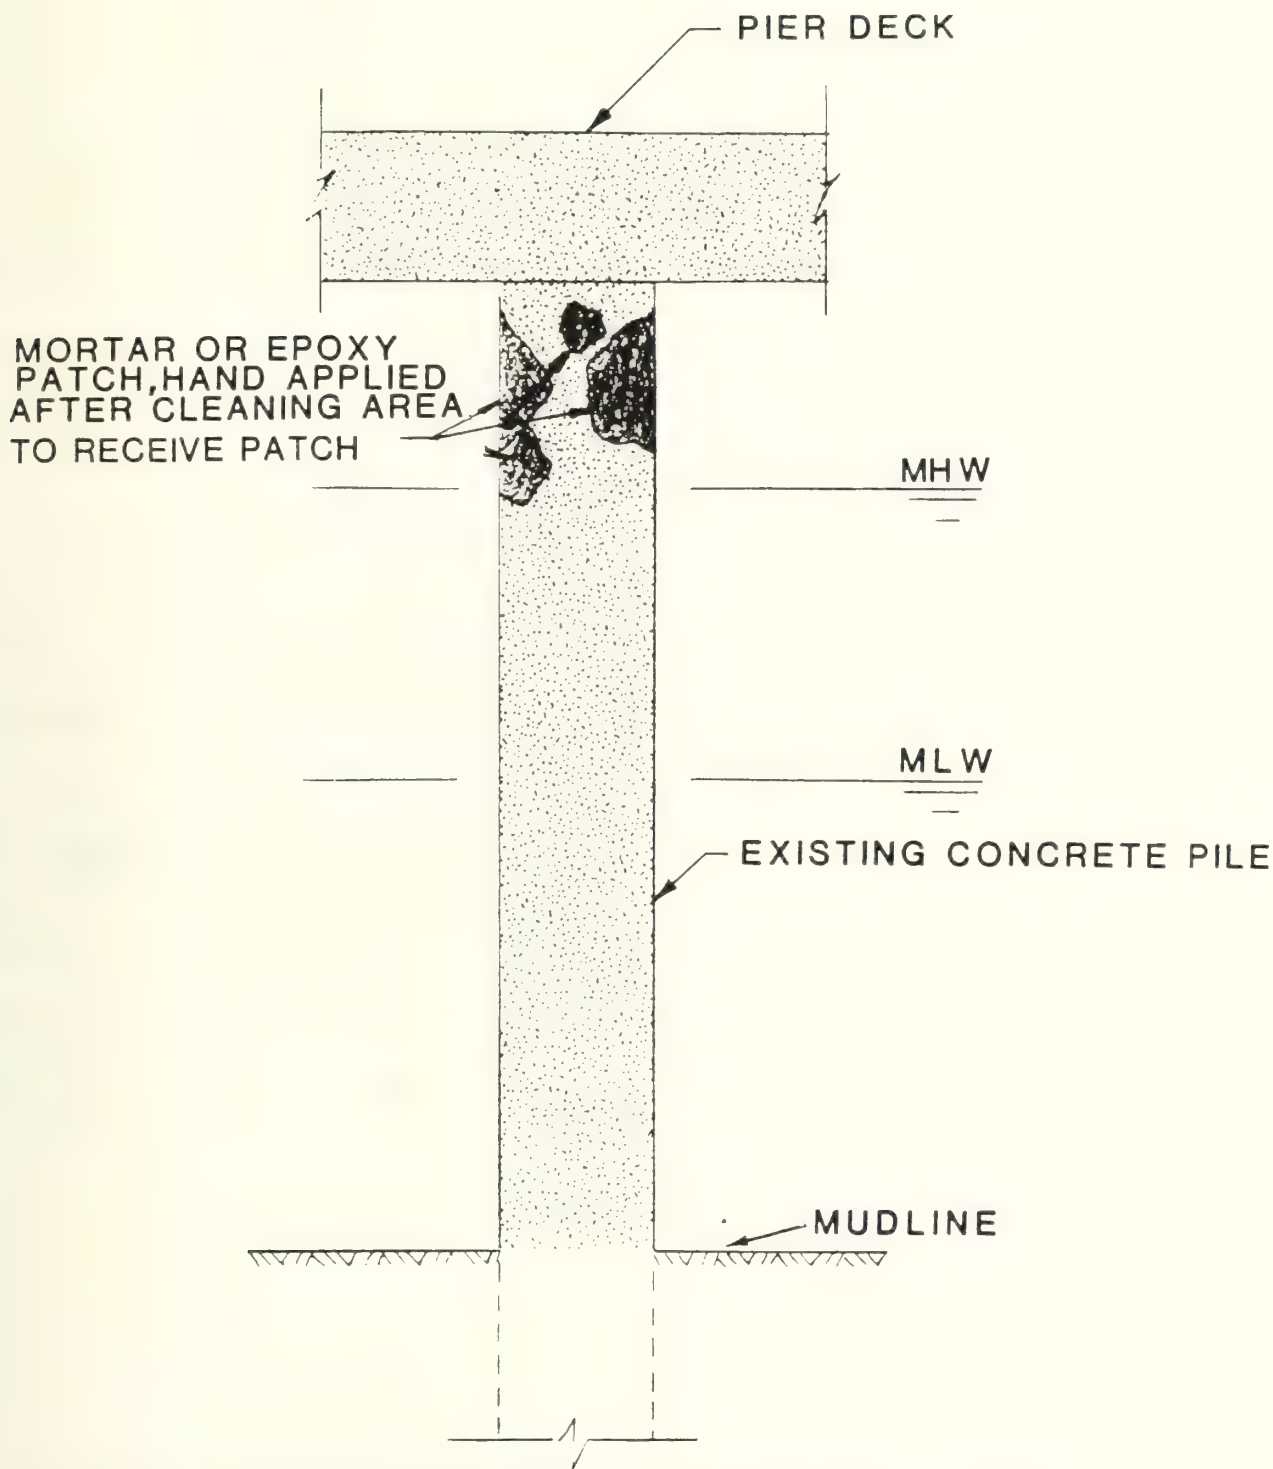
Hand Applied Patch Material on Concrete Pier Pile
